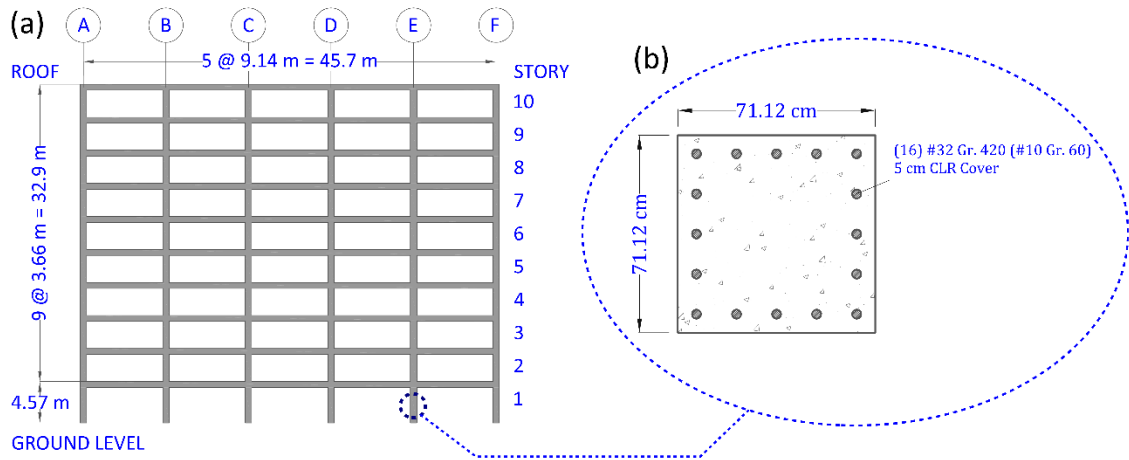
Prototype RC building frame: (a) front face elevation and (b) typical column section details
